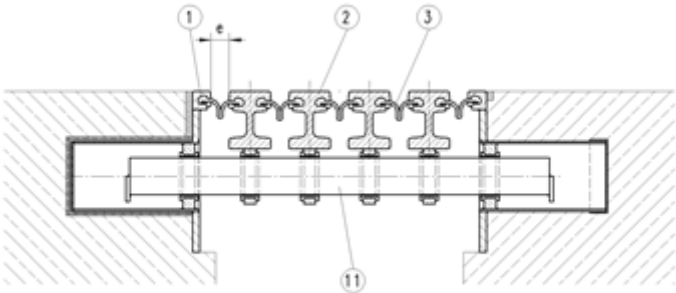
Cross section at footpath with crossbeam of multiple crossbeam modular expansion joint with compression control elements
